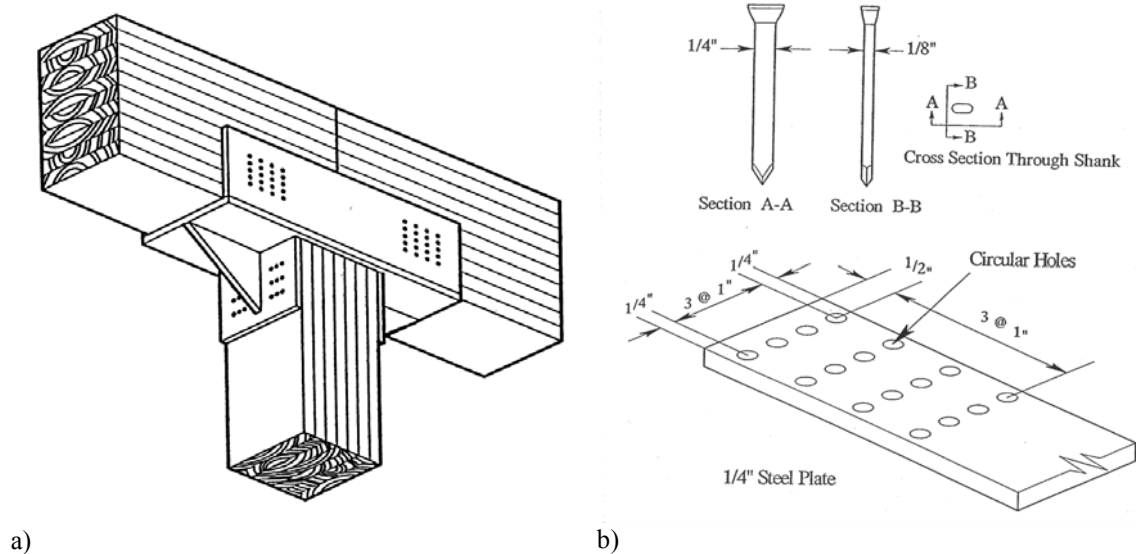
a) Typical column to beam riveted connection; b) Parts of a typical riveted connection
